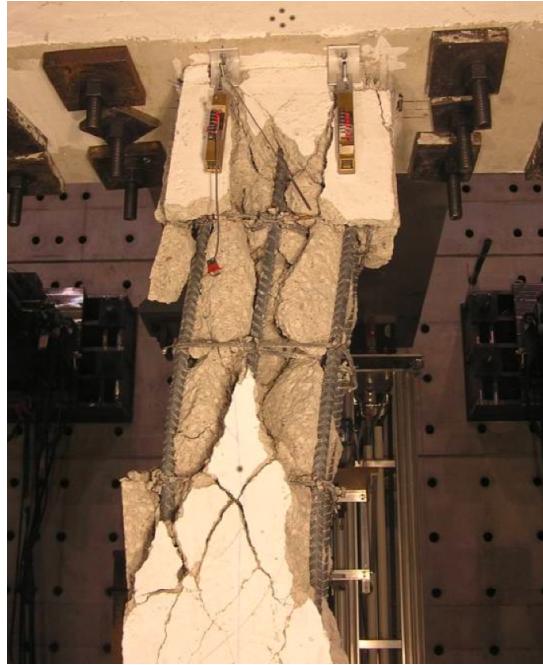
Nonductile concrete column tested to axial failure at the NEES facility at University of Minnesota.
